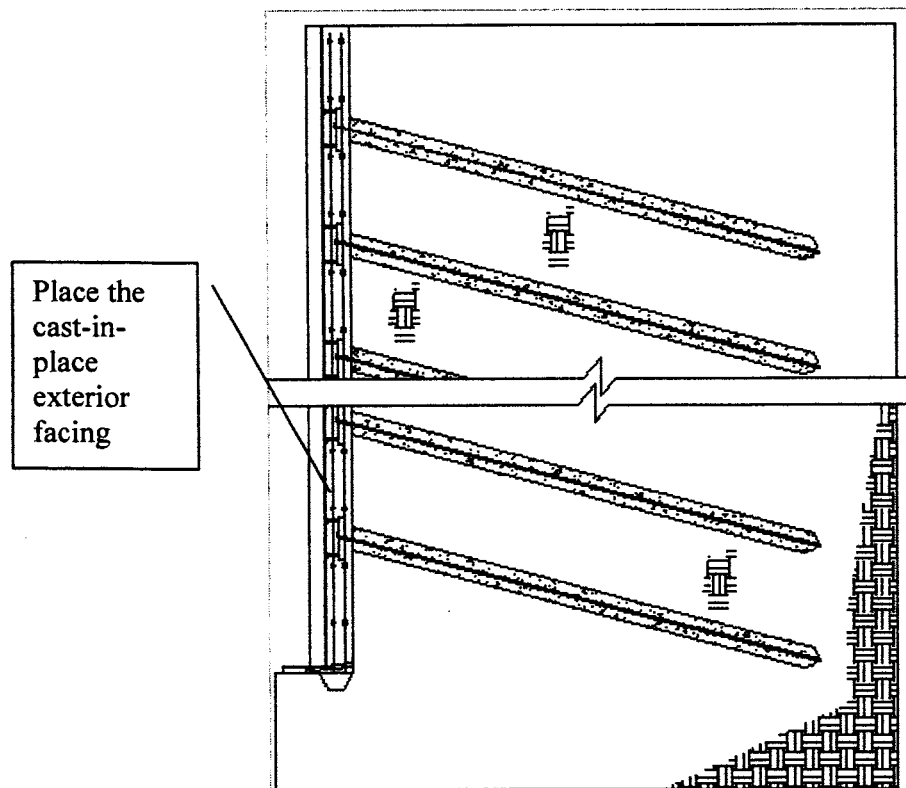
Picture showing step 11 of the construction process of Soil Nail wall
